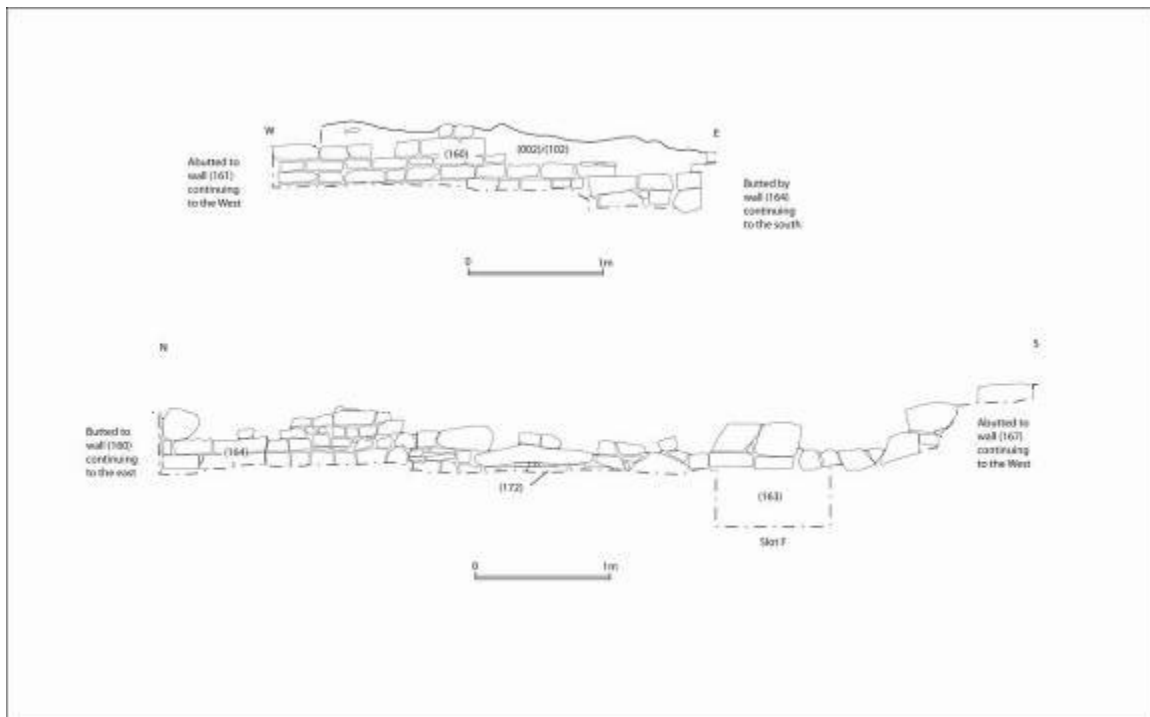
a & b: South-facing elevation of northern wall (160) (upper), and west-facing elevation of wall (164) (lower) both in Trench 3/08. Wall (160), aligned east-west is butted by wall (164) aligned north-south, both forming the north-east corner of gatehouse structure [157]
